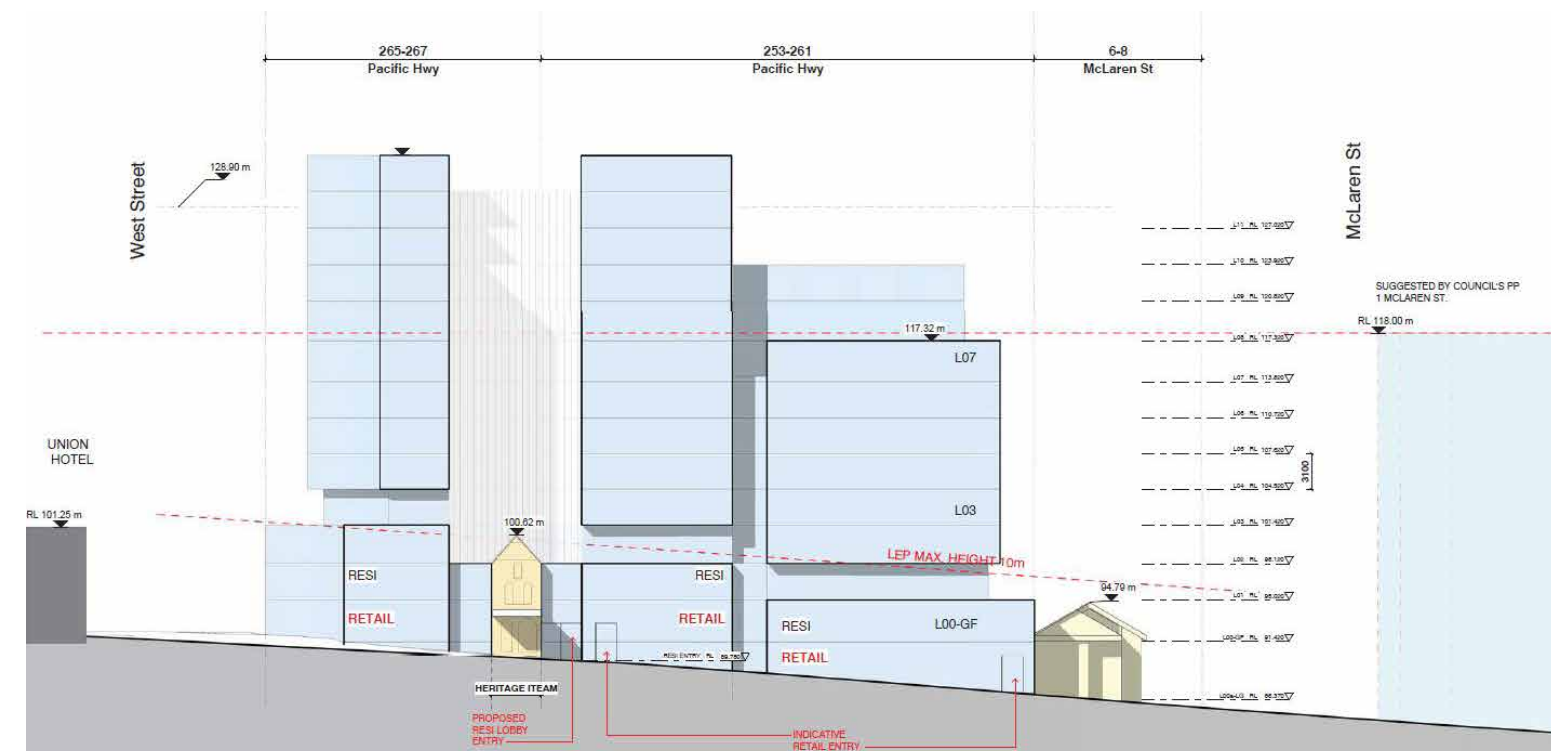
Option 1 - Elevation along Pacific Highway - Option 1 (Adapted from the elevation plan prepared by PTW).
